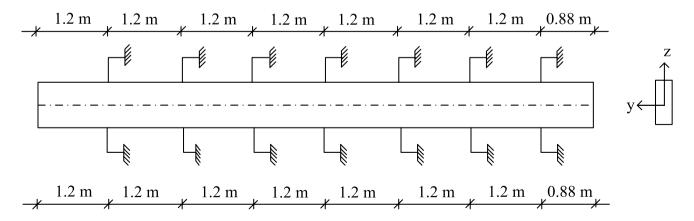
Discrete bracing of the roof beam at the upper and bottom level of the beam with lateral supports
